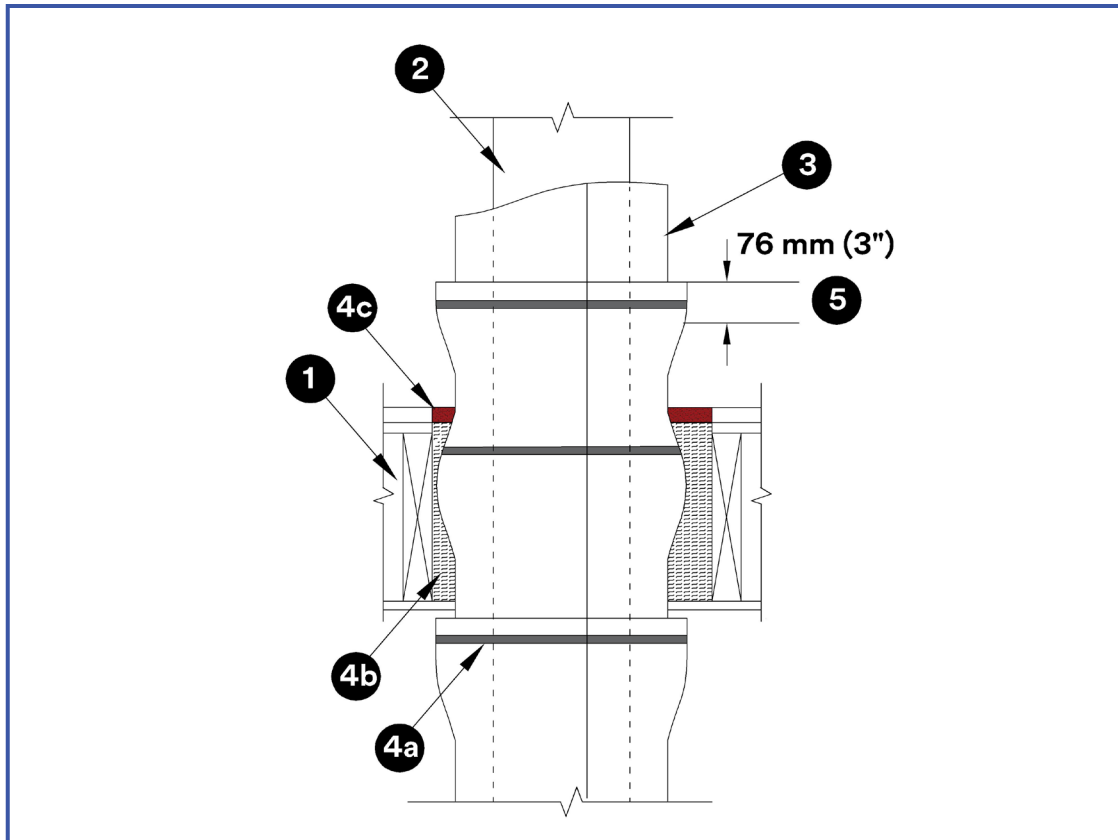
3M™ Fire Barrier Duct Wrap 615+ continuous through 1-hour fire-resistance rated wood-framed floor / ceiling assembly
